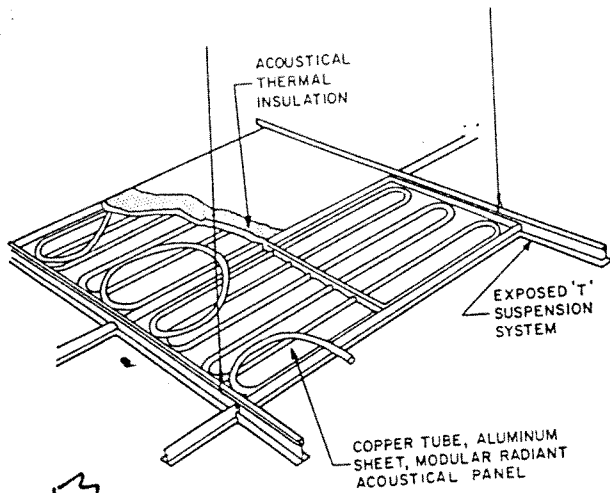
Metal Ceiling Panels Bonded to Copper Tubing
